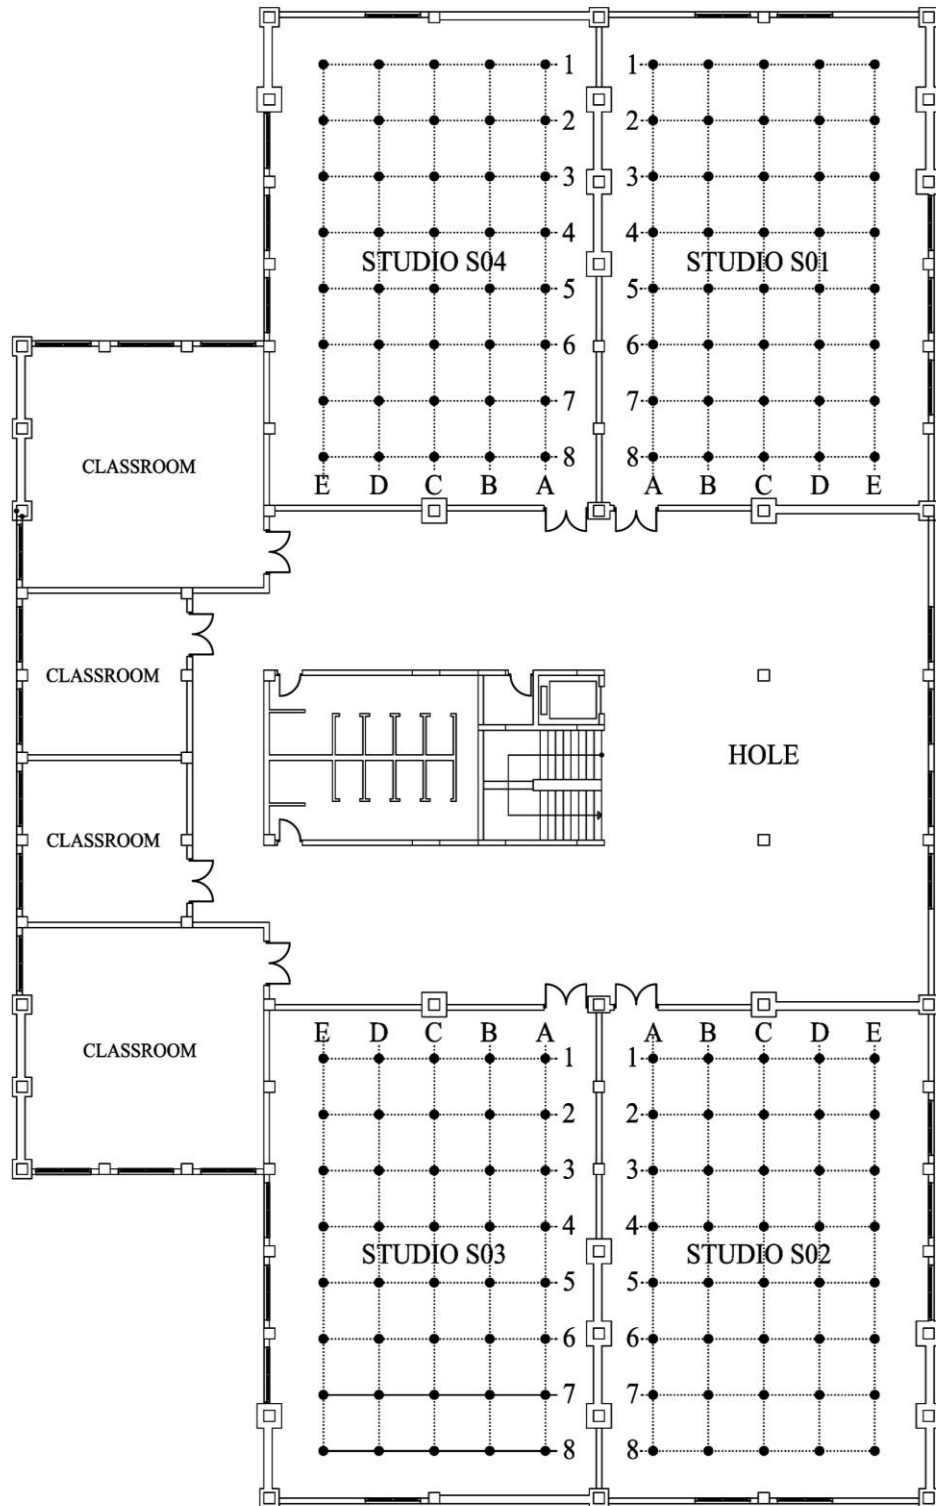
General layout of the building (3rd floor) and the measurement points
